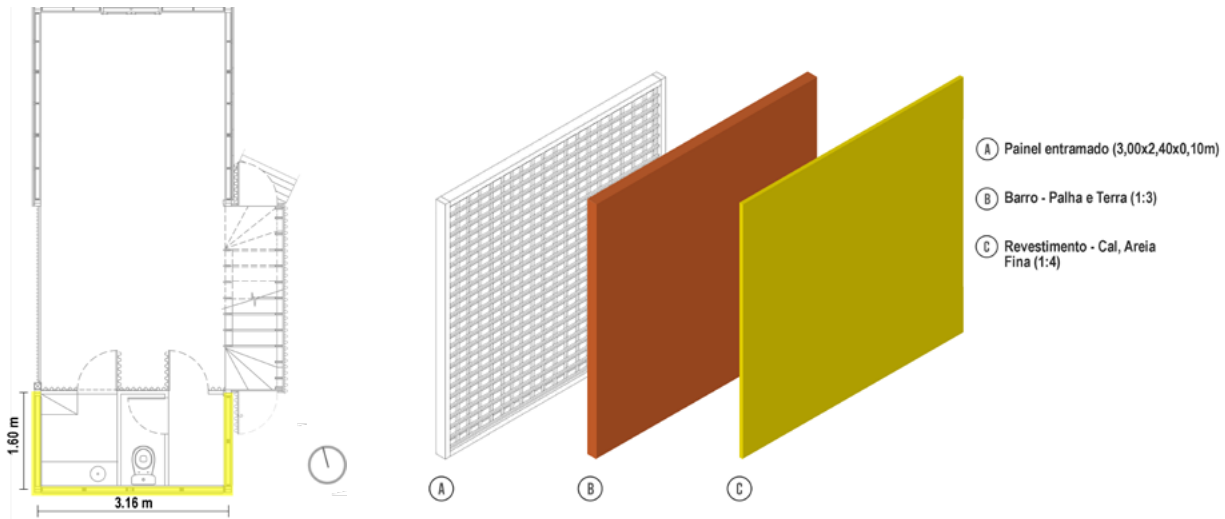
Plan and detailing of the wattle and daub panels of Unit 001 (Nomads)
